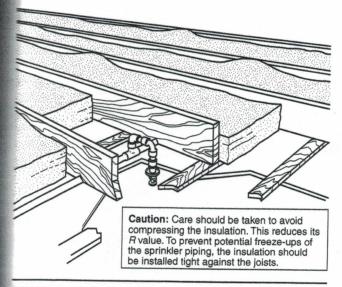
(e) Insulation Recommendations — Arrangement 5.
